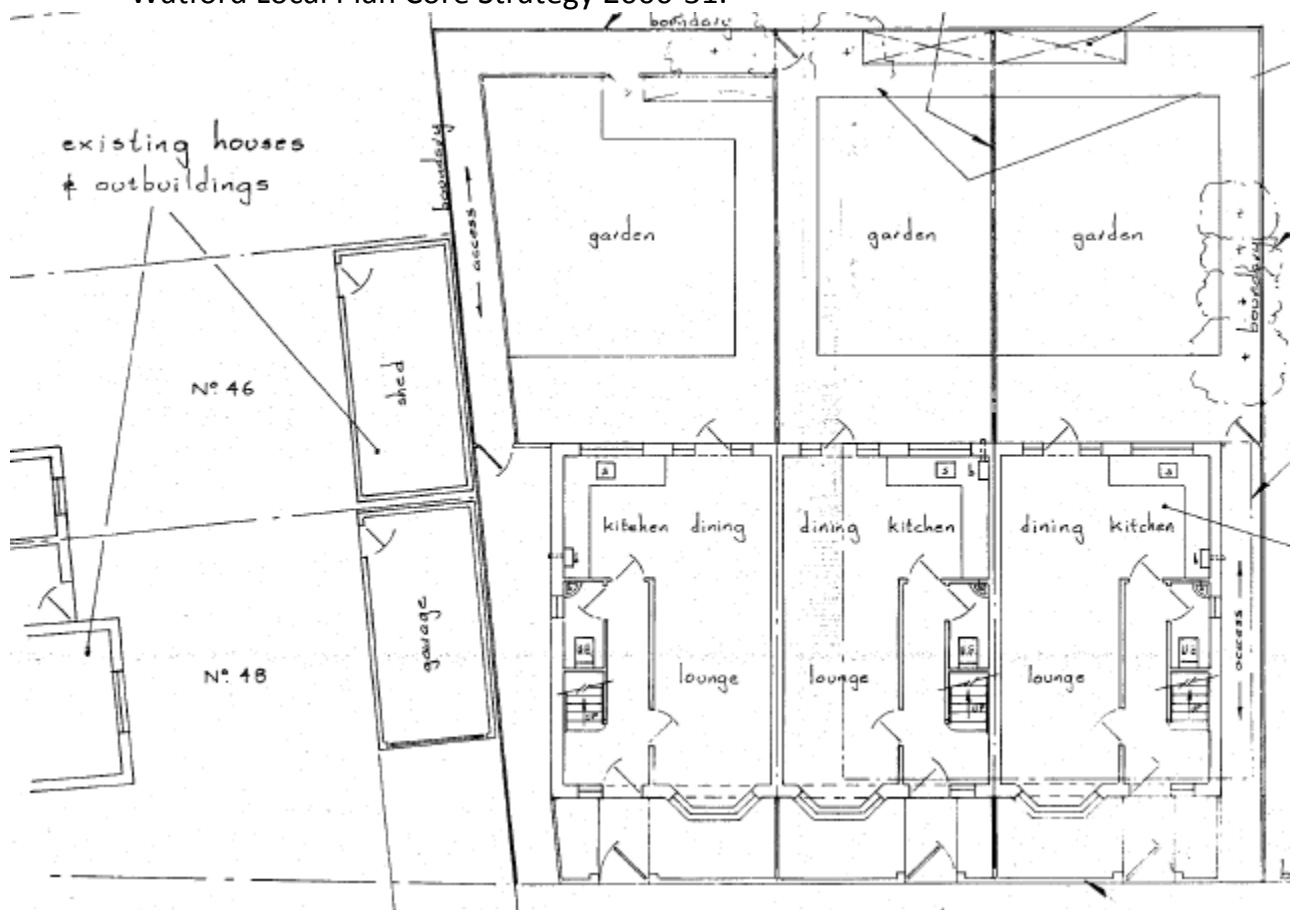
Refused site plan for planning application 14/00170/FUL.
